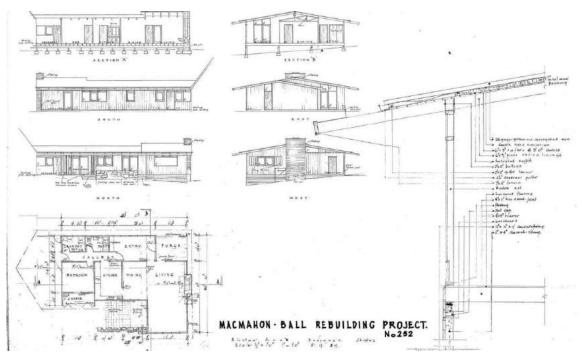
The Knox plan for the Ball rebuilding project, 1959. (Source: A Knox 5 September 1959, Job No 252, Alistair Knox Foundation).
